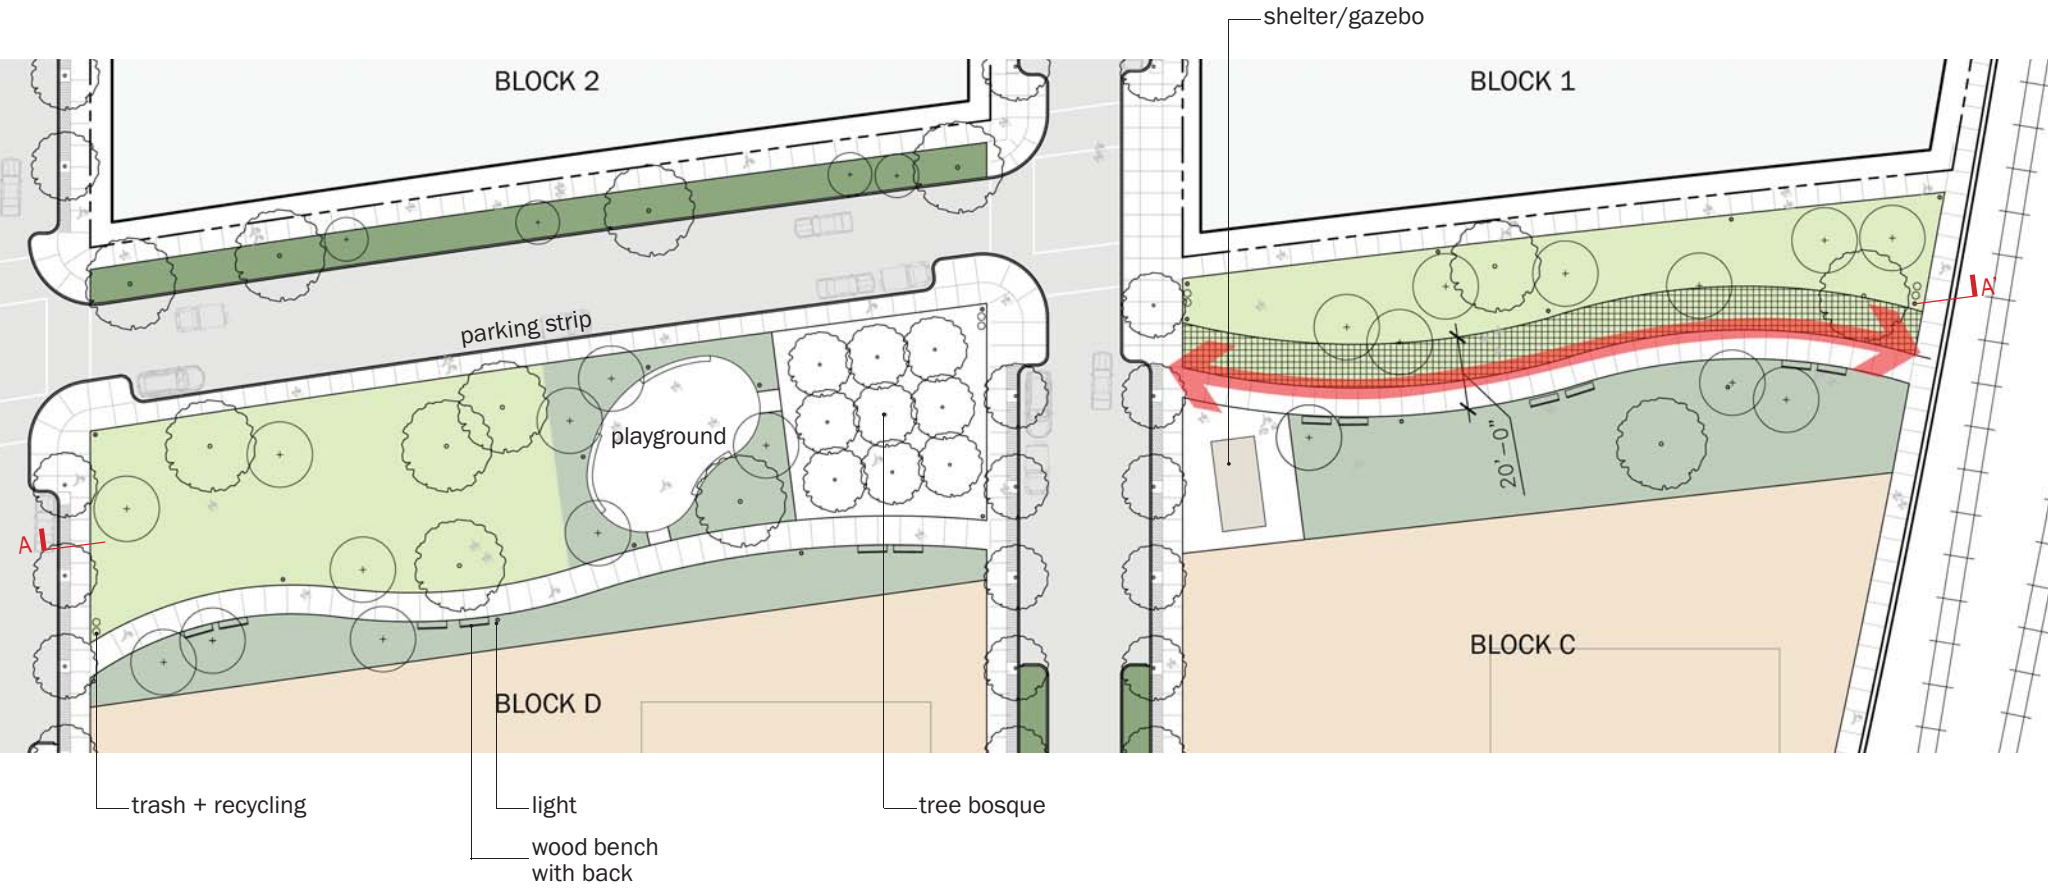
o - P7: DIAGONAL PARK TO DRY DOCK - SECTION
